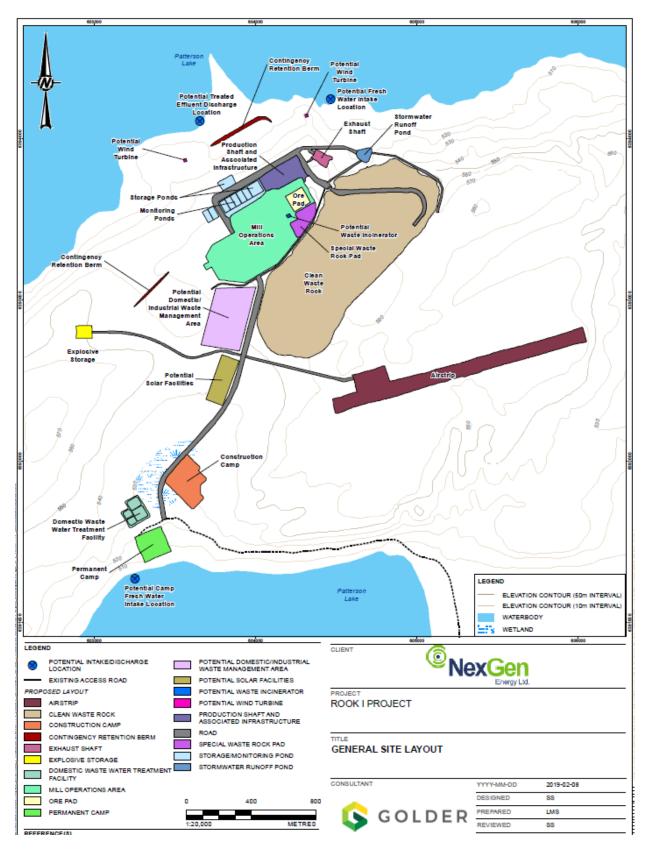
Site Layout of the Rook 1 Project, from EIS Figure 2.3-1 (NexGen, 2022)
